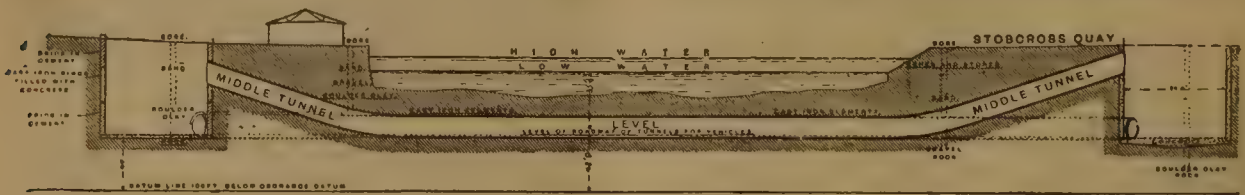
TRANSVERSE SECTION OF RIVER, SHOWING TUNNELS AND SHAFTS.
